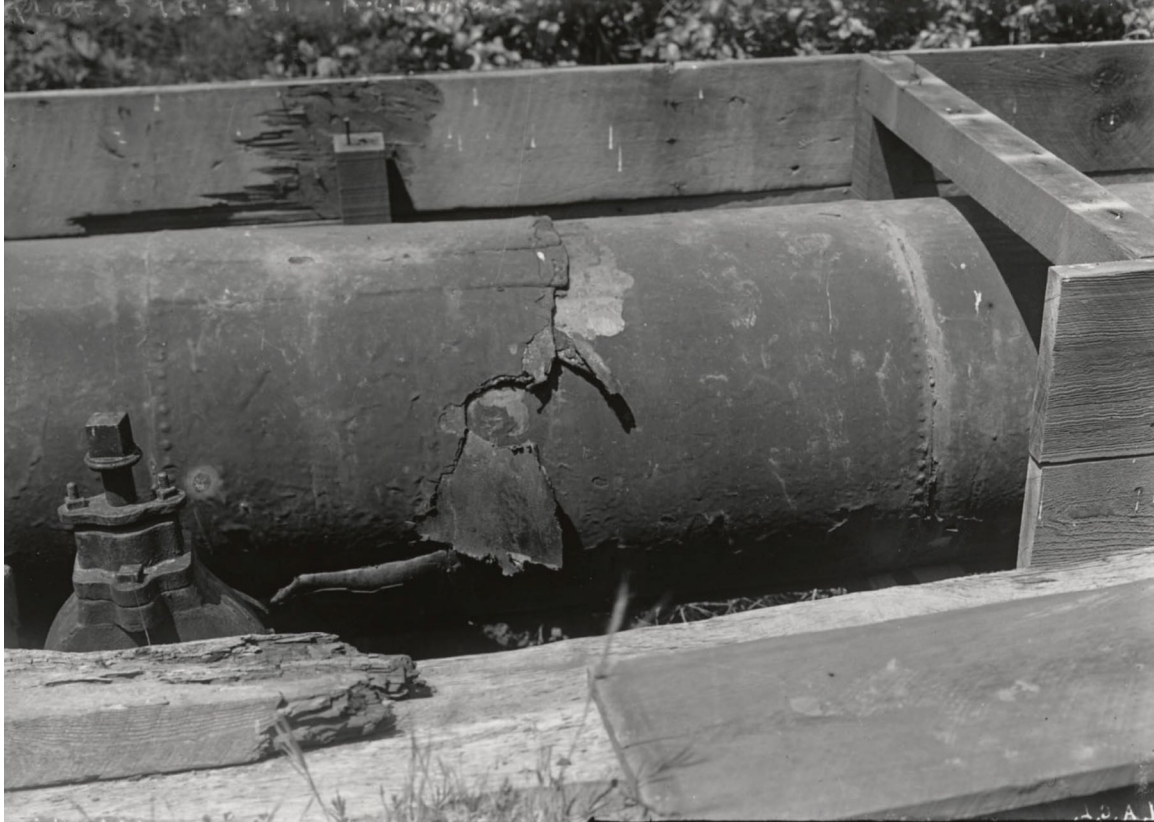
South of FX-3. Failure of Pilarcitos 30 inch pipeline. About 1 mile northwest of San Andreas Reservoir. Looking easterly. (Photo: Lawson 1908)
